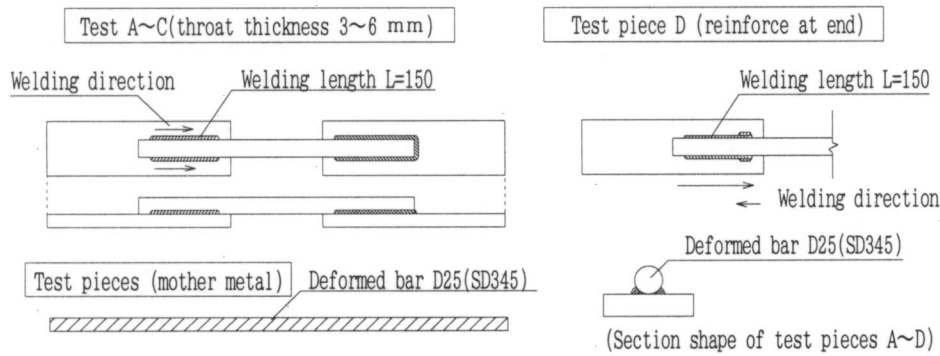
Tensile test pieces for selection of welding detail
